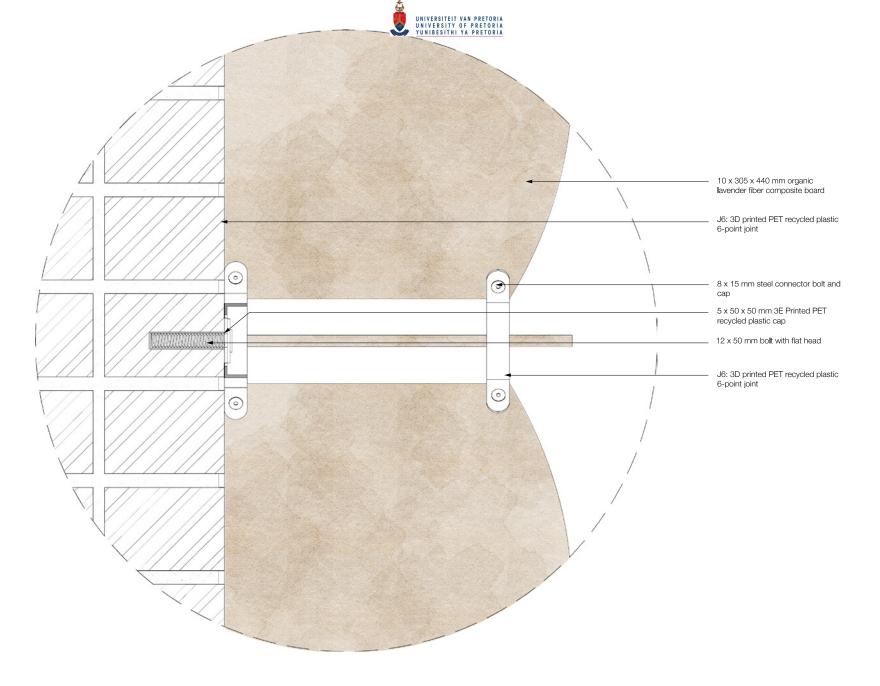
Detail 2: Vertical display wall connection (Author, 2016)
